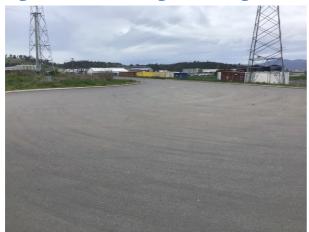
Approach to 1 & 13 Crooked Billet Drive
